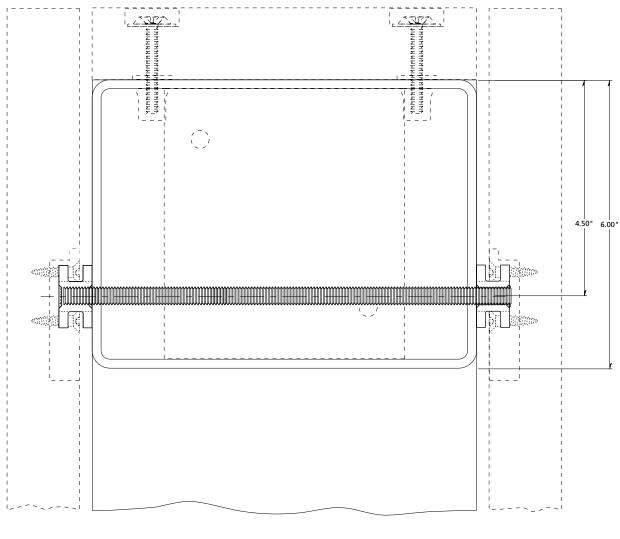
" x 6" STEEL RAIL PLUG SCHEMATIC ASSEMBLY
